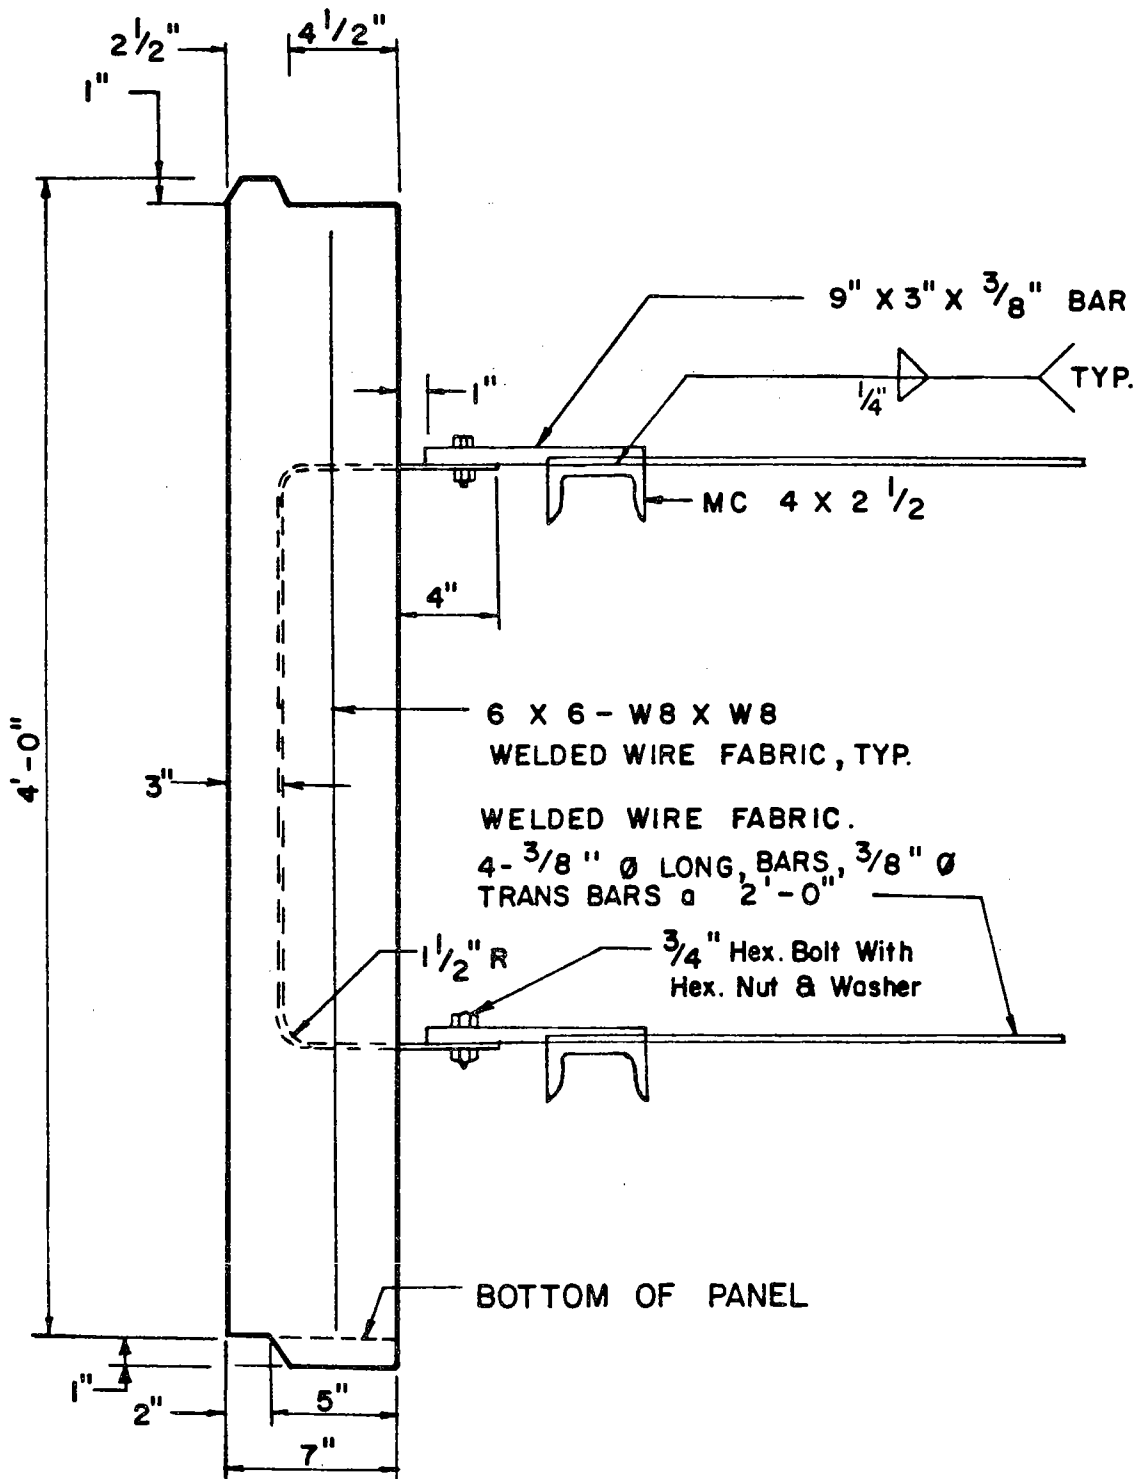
TYPICAL PANEL CROSS SECTION AND
